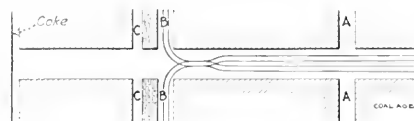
PLAN OF SLOPE BOTTOM, SHOWING ARRANGEMENT OF TRACKS
